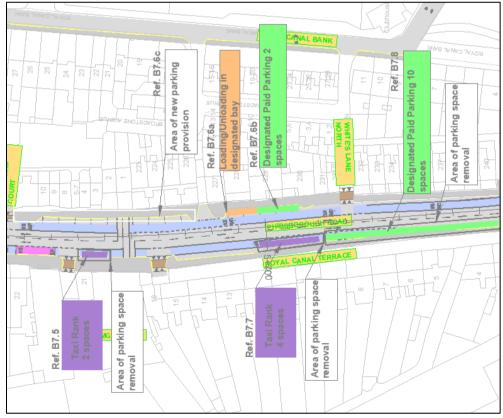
Proposed scheme design and parking changes along Phibsborough Road (Between Monck Place and King Street North)
